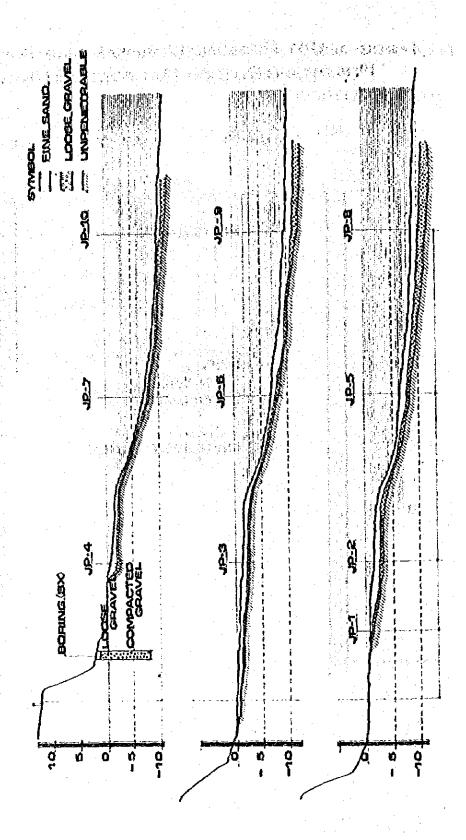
JET PIERCING BORING LOG (2) FOR PROPOSED SITE FOR PACABMAYO PORT CONSTRUCTION
